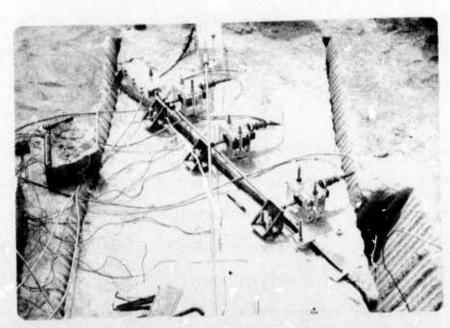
In-situ specimen. DCDTs along joint, three linear potentiometers across joint and several strain gages on top surface of the specimen. Note displacement of joint.
